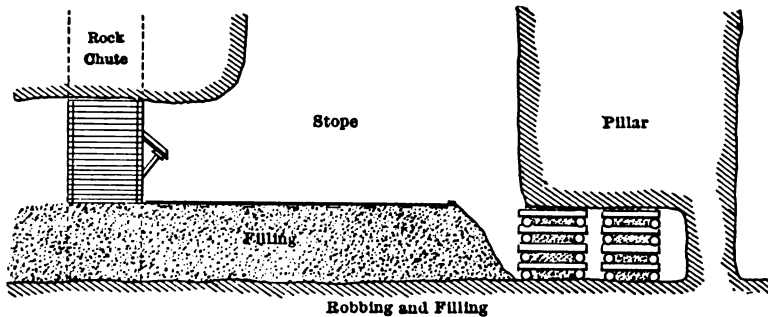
FILLING SYSTEM, SECTION 16 MINE.
